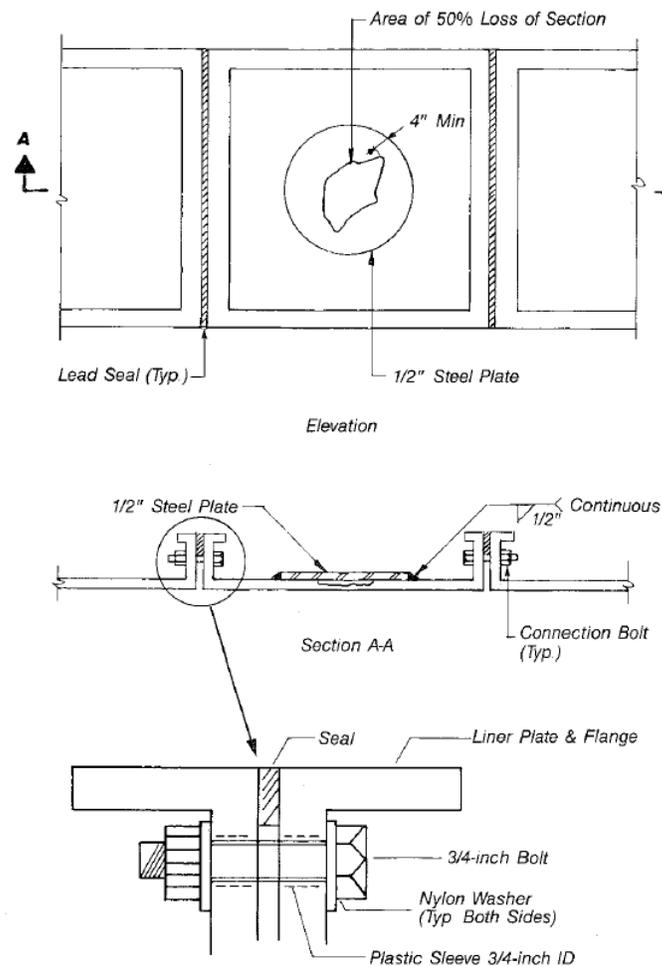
Steel Segmental Liner Repair (Russell, 2000)
